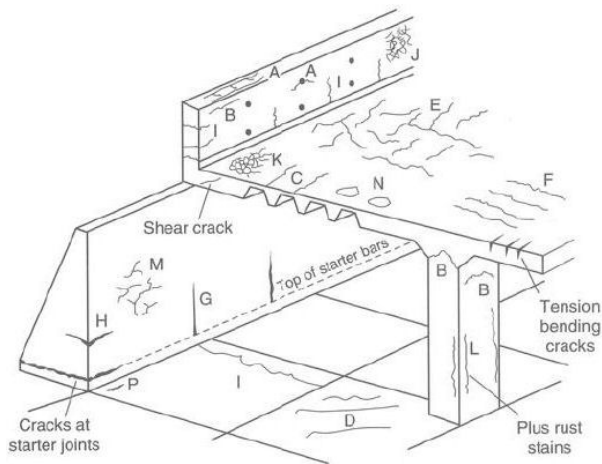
Examples of intrinsic cracks in a hypothetical concrete structure (from [37])
